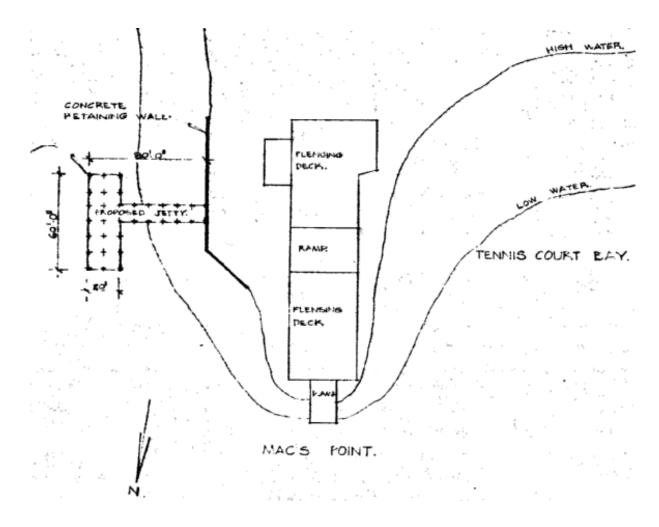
Plan of the whaling station in 1959, showing proposed jetty. MD plan 10721.
